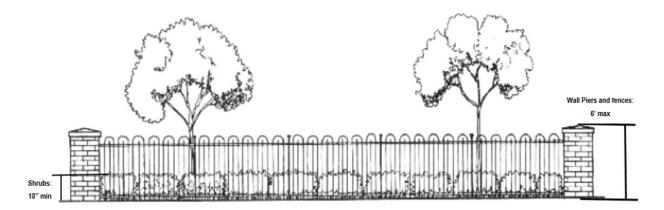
Figure C: An example of decorative pillar/wrought iron fence combination and shrub/tree line.
